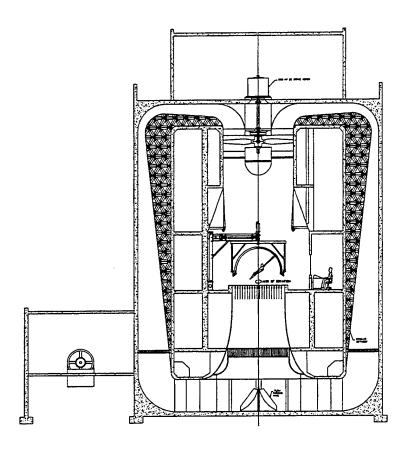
AFRL Vertical Wind Tunnel Layout
